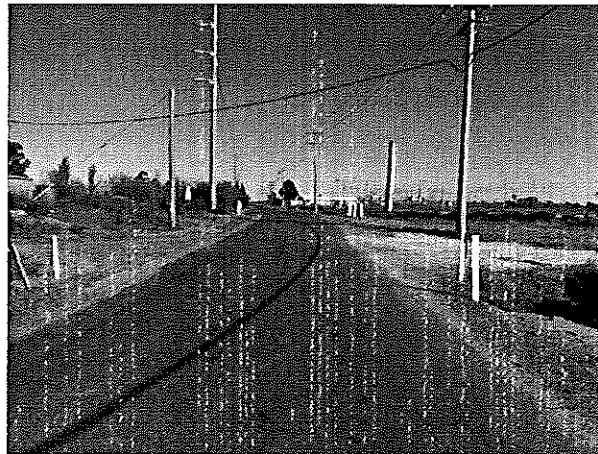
Hamilton Road. Photo taken from Hamilton Road looking south-west.
